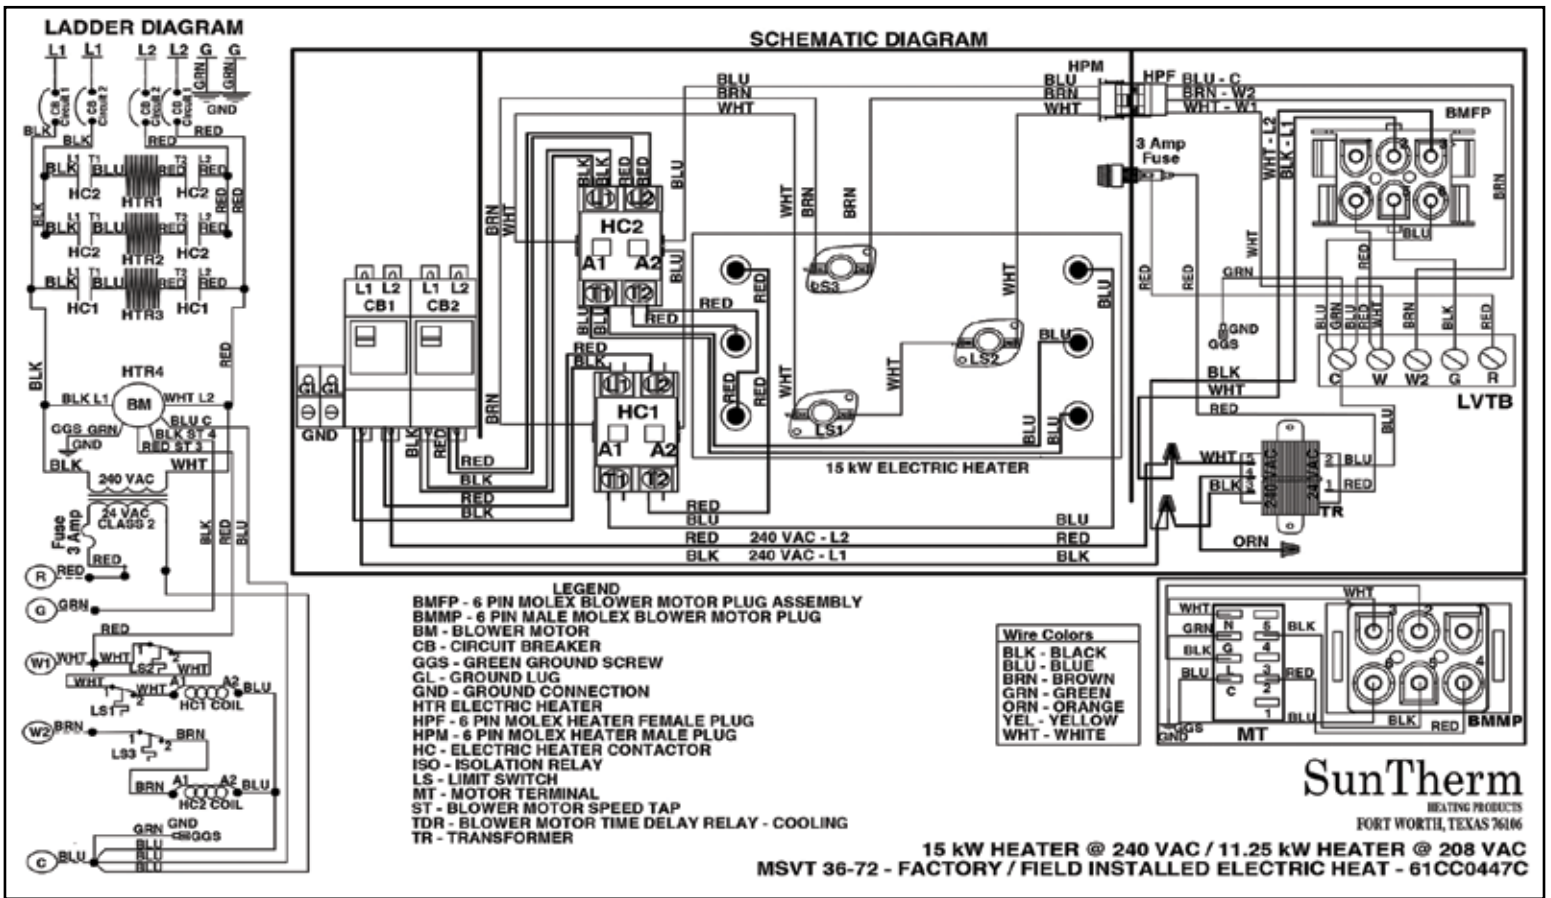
MSVT 25-72 – Constant Torque Motor – 15kW Electric Heater
